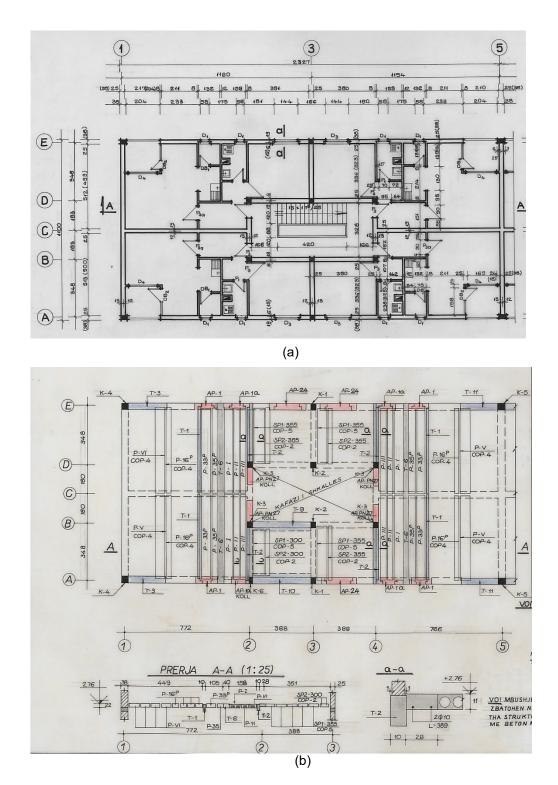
Standardized floor plan of a five-story confined masonry building in Albania: (a) the architectural plan and (b) structural plan (AQTN, 1983).
